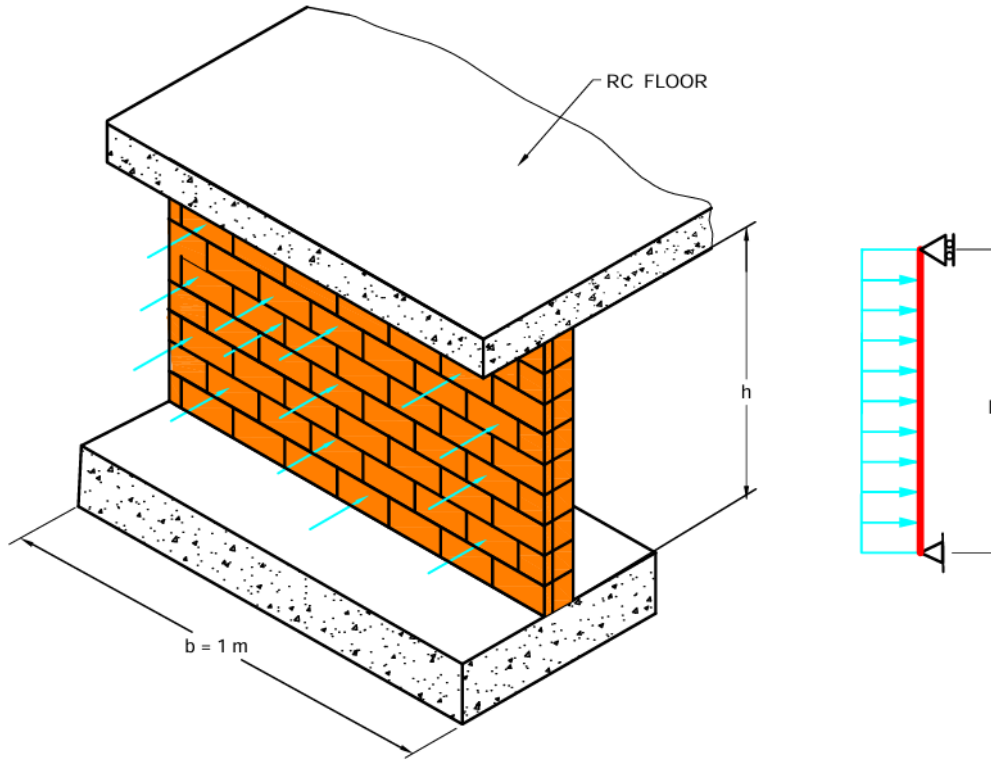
UNIT LENGTH b OF MASONRY WALL CONSIDERED FOR OUT-OF-PLANE BENDING IN VERTICAL DIRECTION
